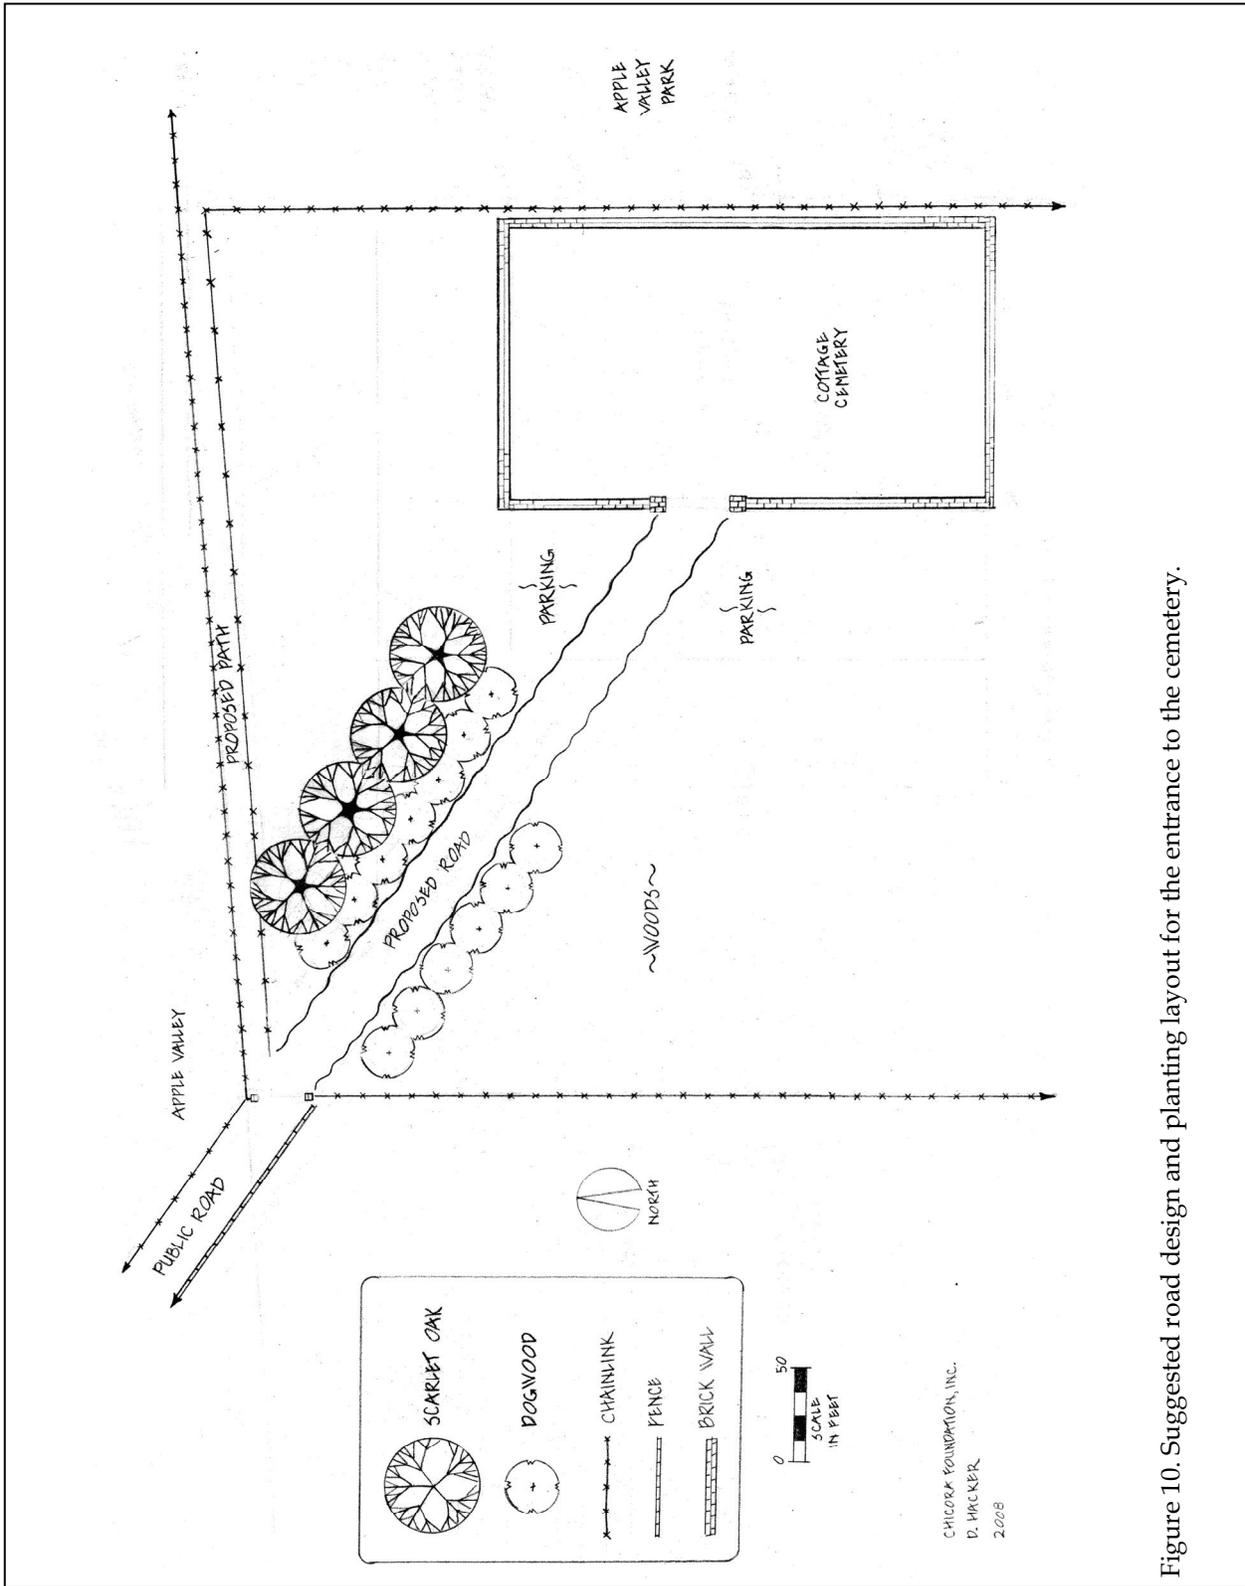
Suggested road design and planting layout for the entrance to the cemetery.
